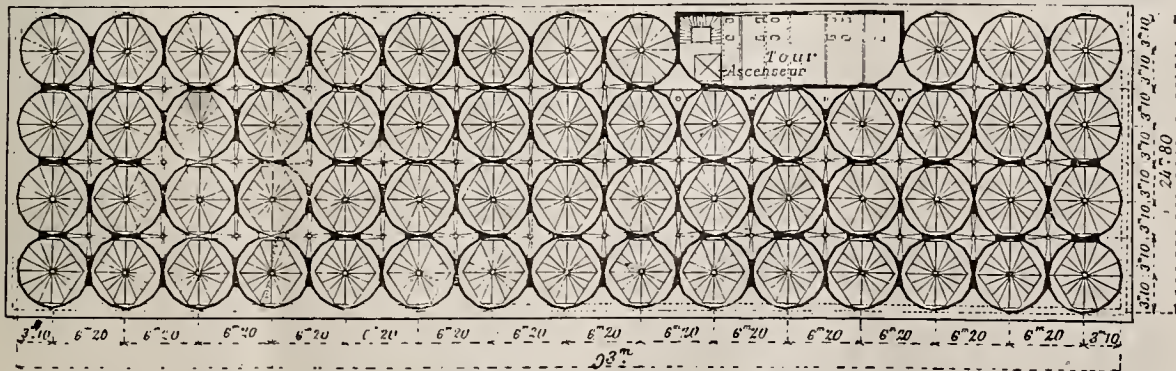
CROSS SECTION OF THE ELEVATOR AT MARSEILLES
